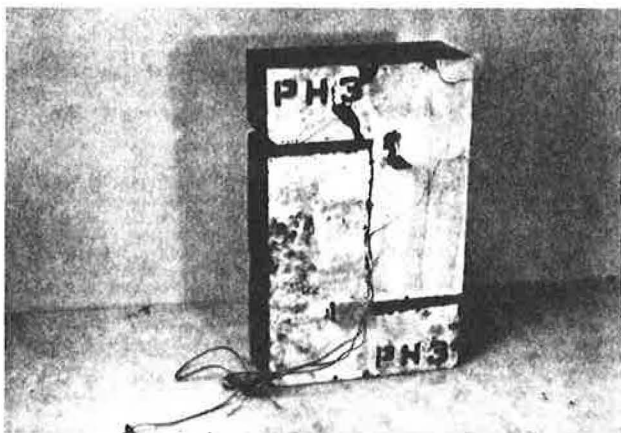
Typical failure of PM and PH specimens (spalling of magnesium phosphate concrete).
